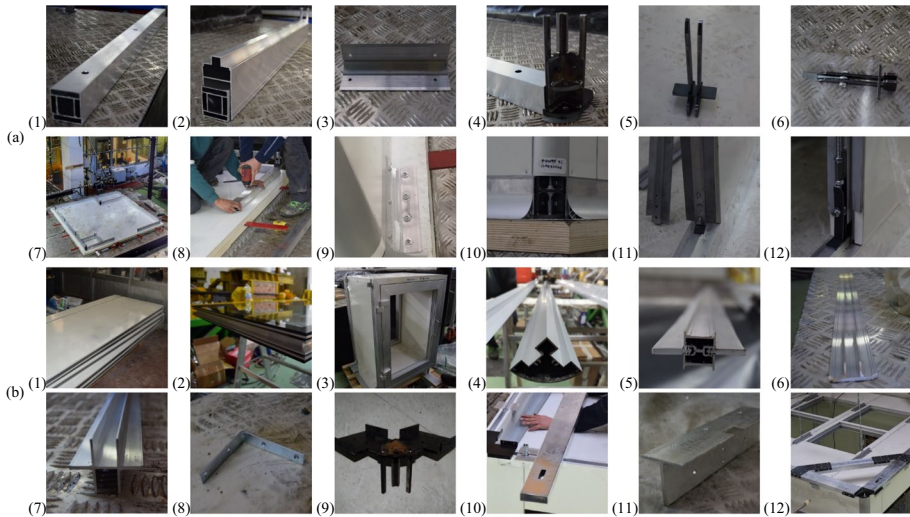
Details of cleanroom components; a base layout: (1) stiffened rectangular cross-section profile, (2) flanged floor rail profiles, (3) angular bracket profile element, (4) bottom splice, (5) bottom block, (6) bottom block with thread rod, (7) base layout, (8) rectangular profile to wood screw fastening, (9) floor rail (and rectangular) profile(s) to wood slab screw fastening using angular bracket element, (10) detail of the bottom splice profiles, (11) fastened to the vertical splice profiles, and (12) connected with a threaded rod; b lateral partition system: (1) blind metal panels, (2) transparent (metal–glass) panels, (3) pass-box chamber, (4) curved angular profiles, (5) (vertical) splice profiles, (6) π -shaped profiles, (7) H-shaped profiles, (8) single bracket elements, (9) top splice, (10) RHS profile, (11) T-profile, and (12) horizontal brace
